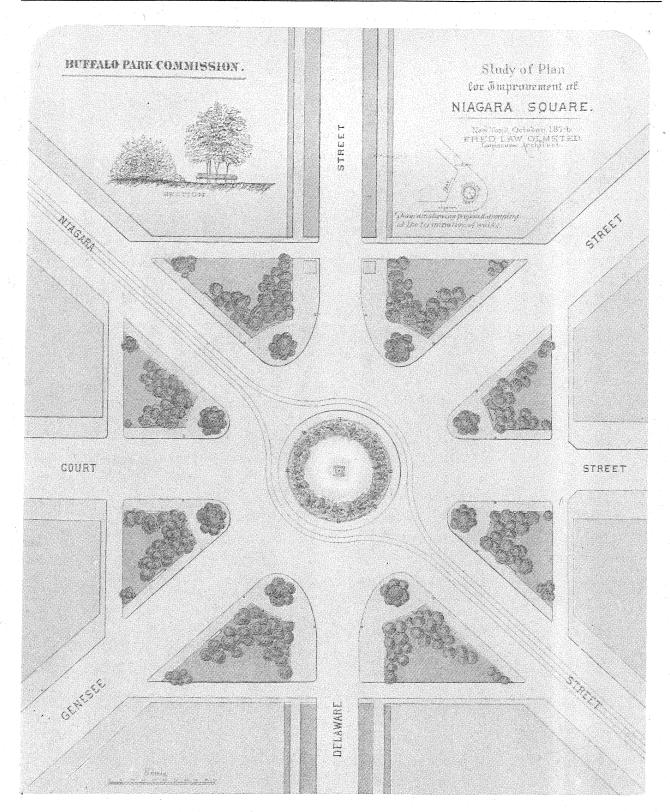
Study of Plan for Improvement of Niagara Square, Buffalo Park Commission, October 1874, Fred. Law Olmsted, Landscape Architect. Courtesy Beveridge collection.
